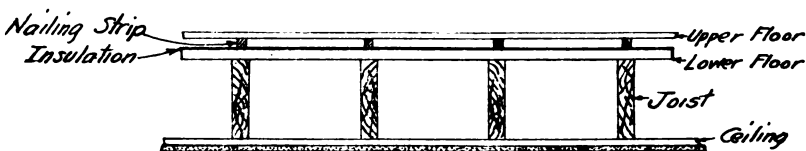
Arrangement of nailing strips on felt or quilt.
